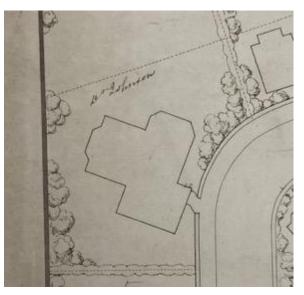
Detail of No. 12 from the original Plan of Park Village West held in the Public Record Office
